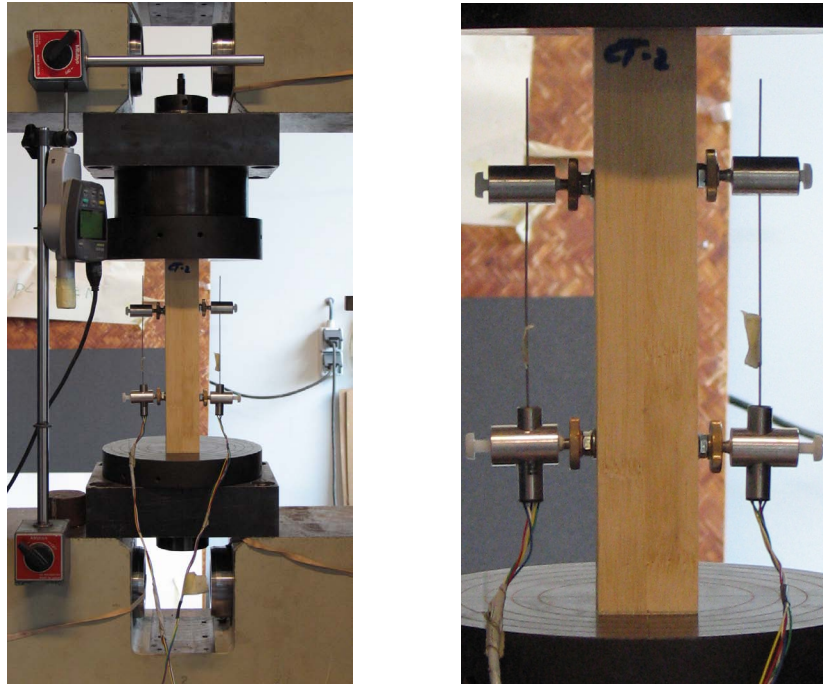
Left: test setup of compression test on laminated test specimens; right: positioning of LVDT-transducers
